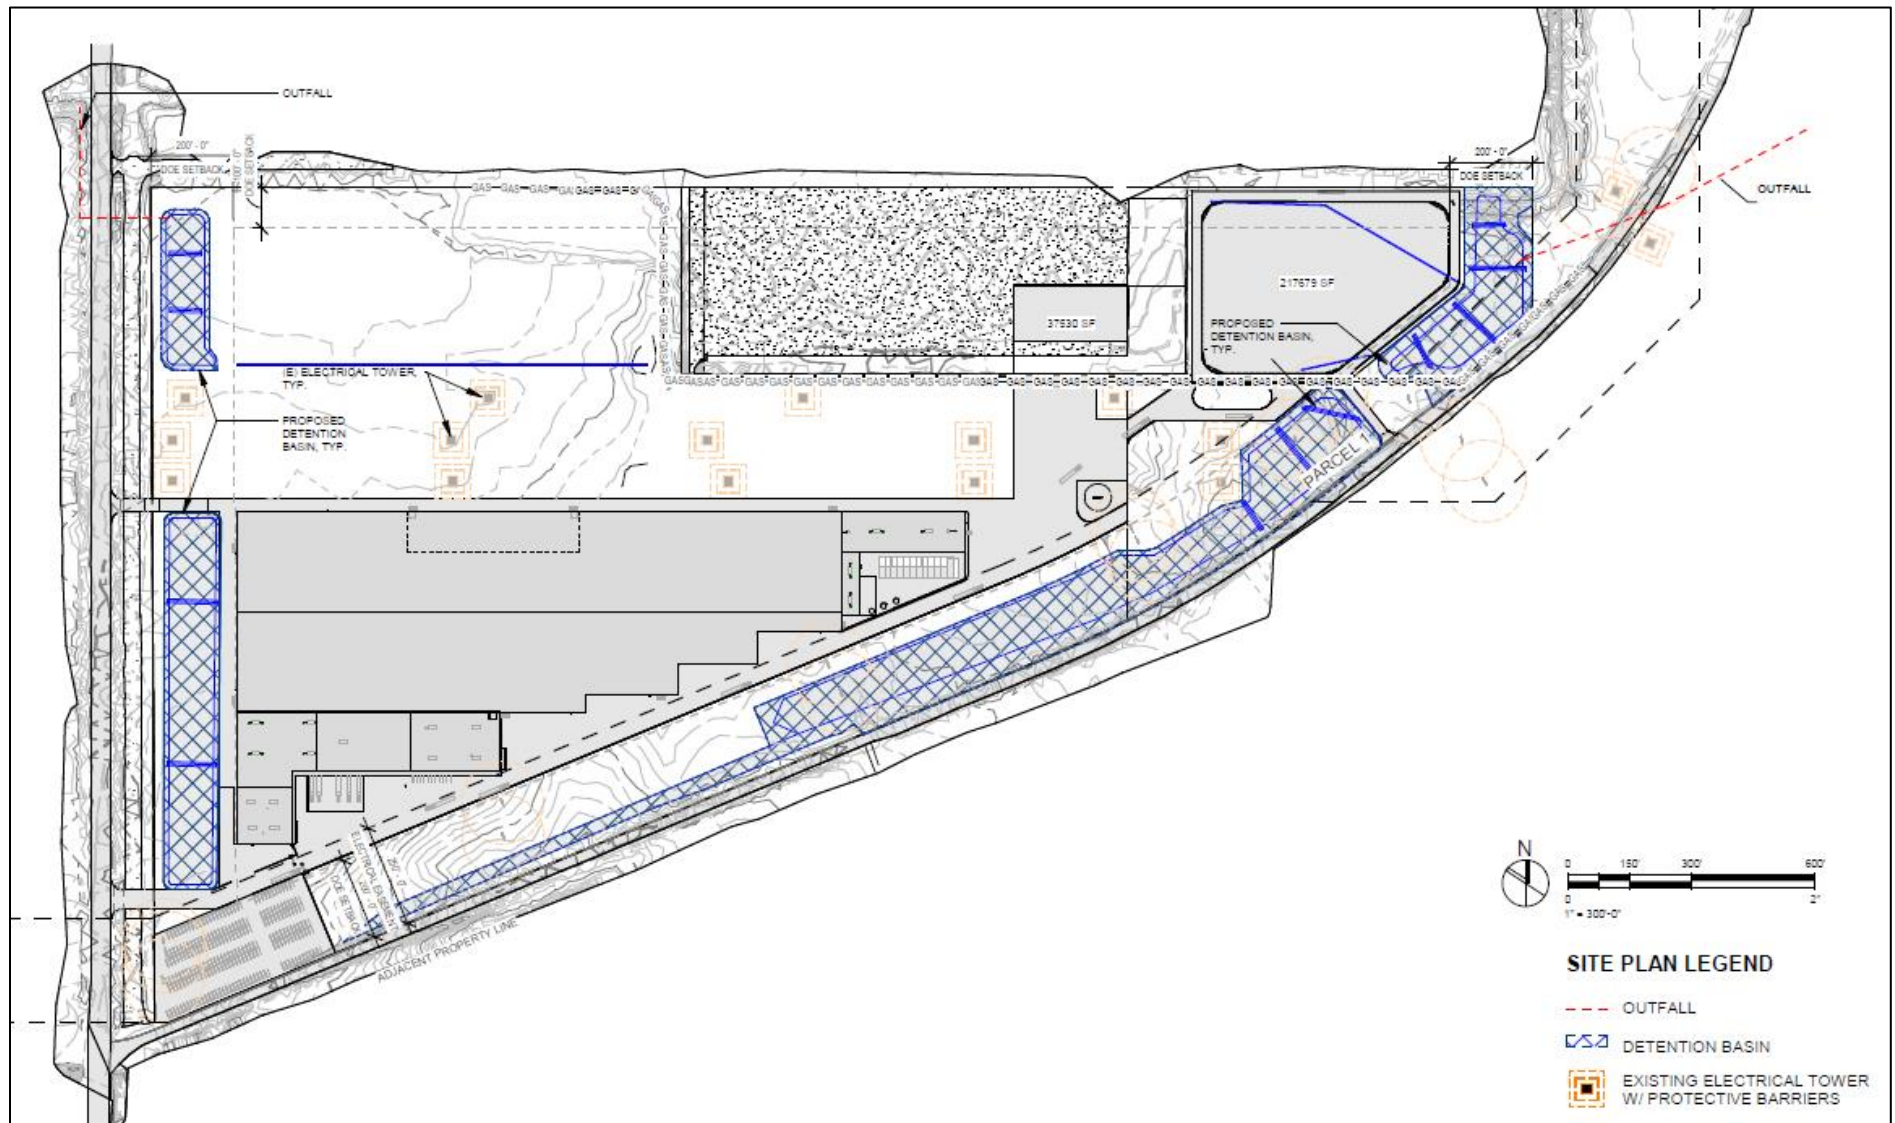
Proposed Outfalls at the General Matter Paducah Enrichment Facility Site
